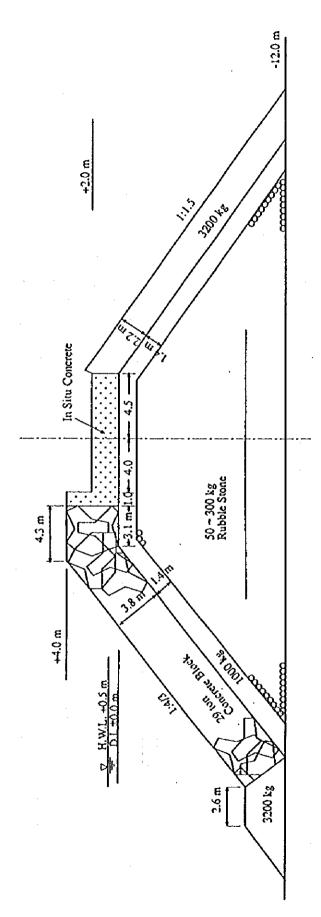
Standard Cross Section of Breakwater (-12.0m)
